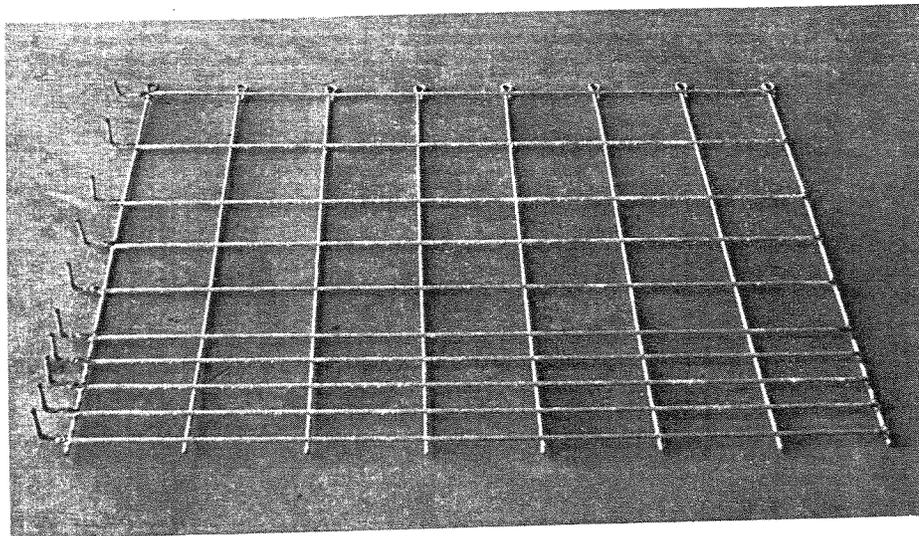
Panel type 1 (32 inches x about 4 feet).
